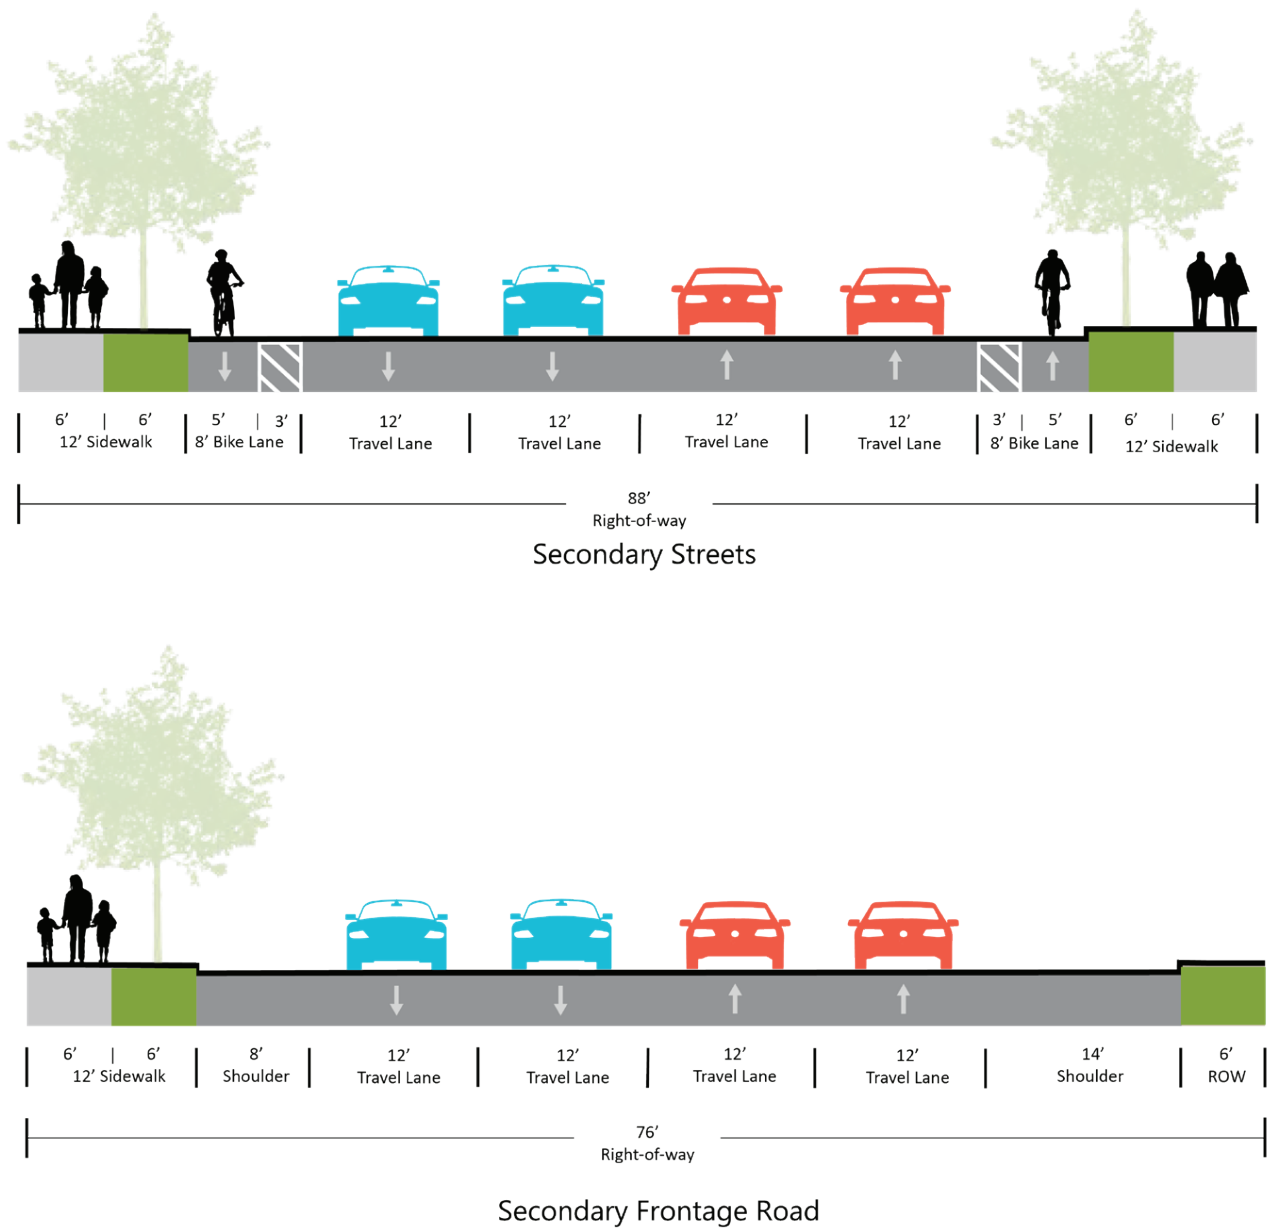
Roadway Cross Sections - Secondary Streets
